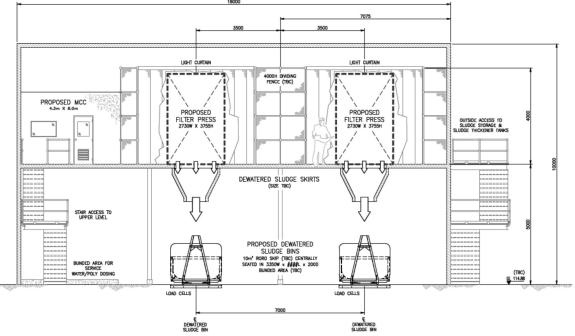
Current Proposed Sludge Plant Layout (Source: TBC)
